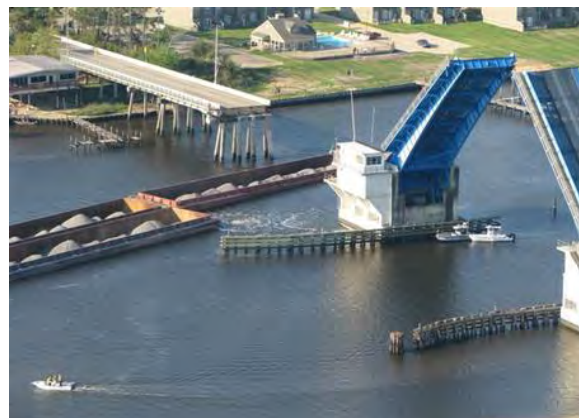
Popp's Ferry Bridge Collapse, Mississippi, U.S. (2009)
